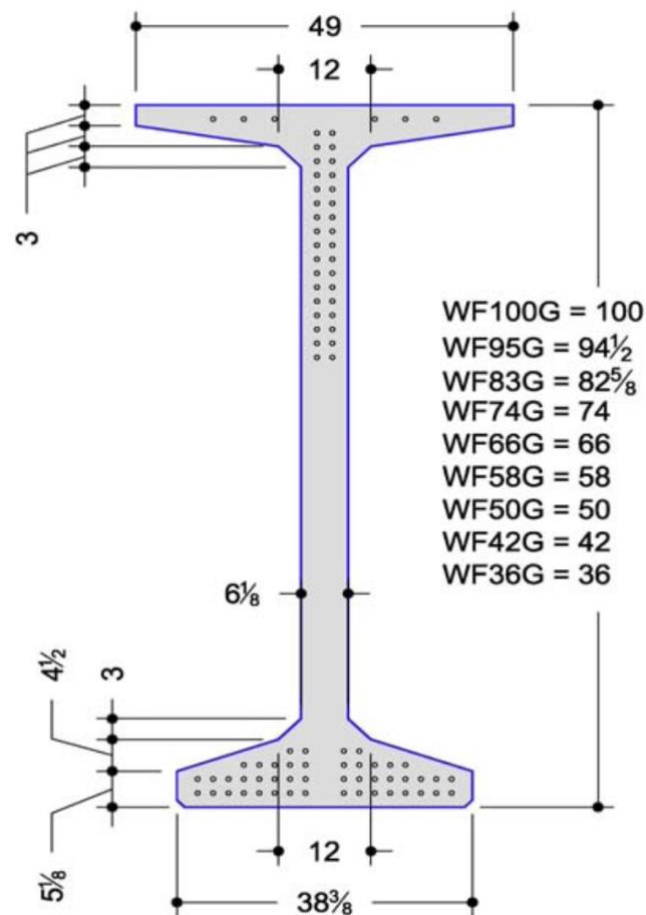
Typical Strand Locations and Dimensions of WSDOT WF Girder Series. Accessed from CTC Girder Span Capability Design Chart (Concrete Technology Corporation, 2009).
